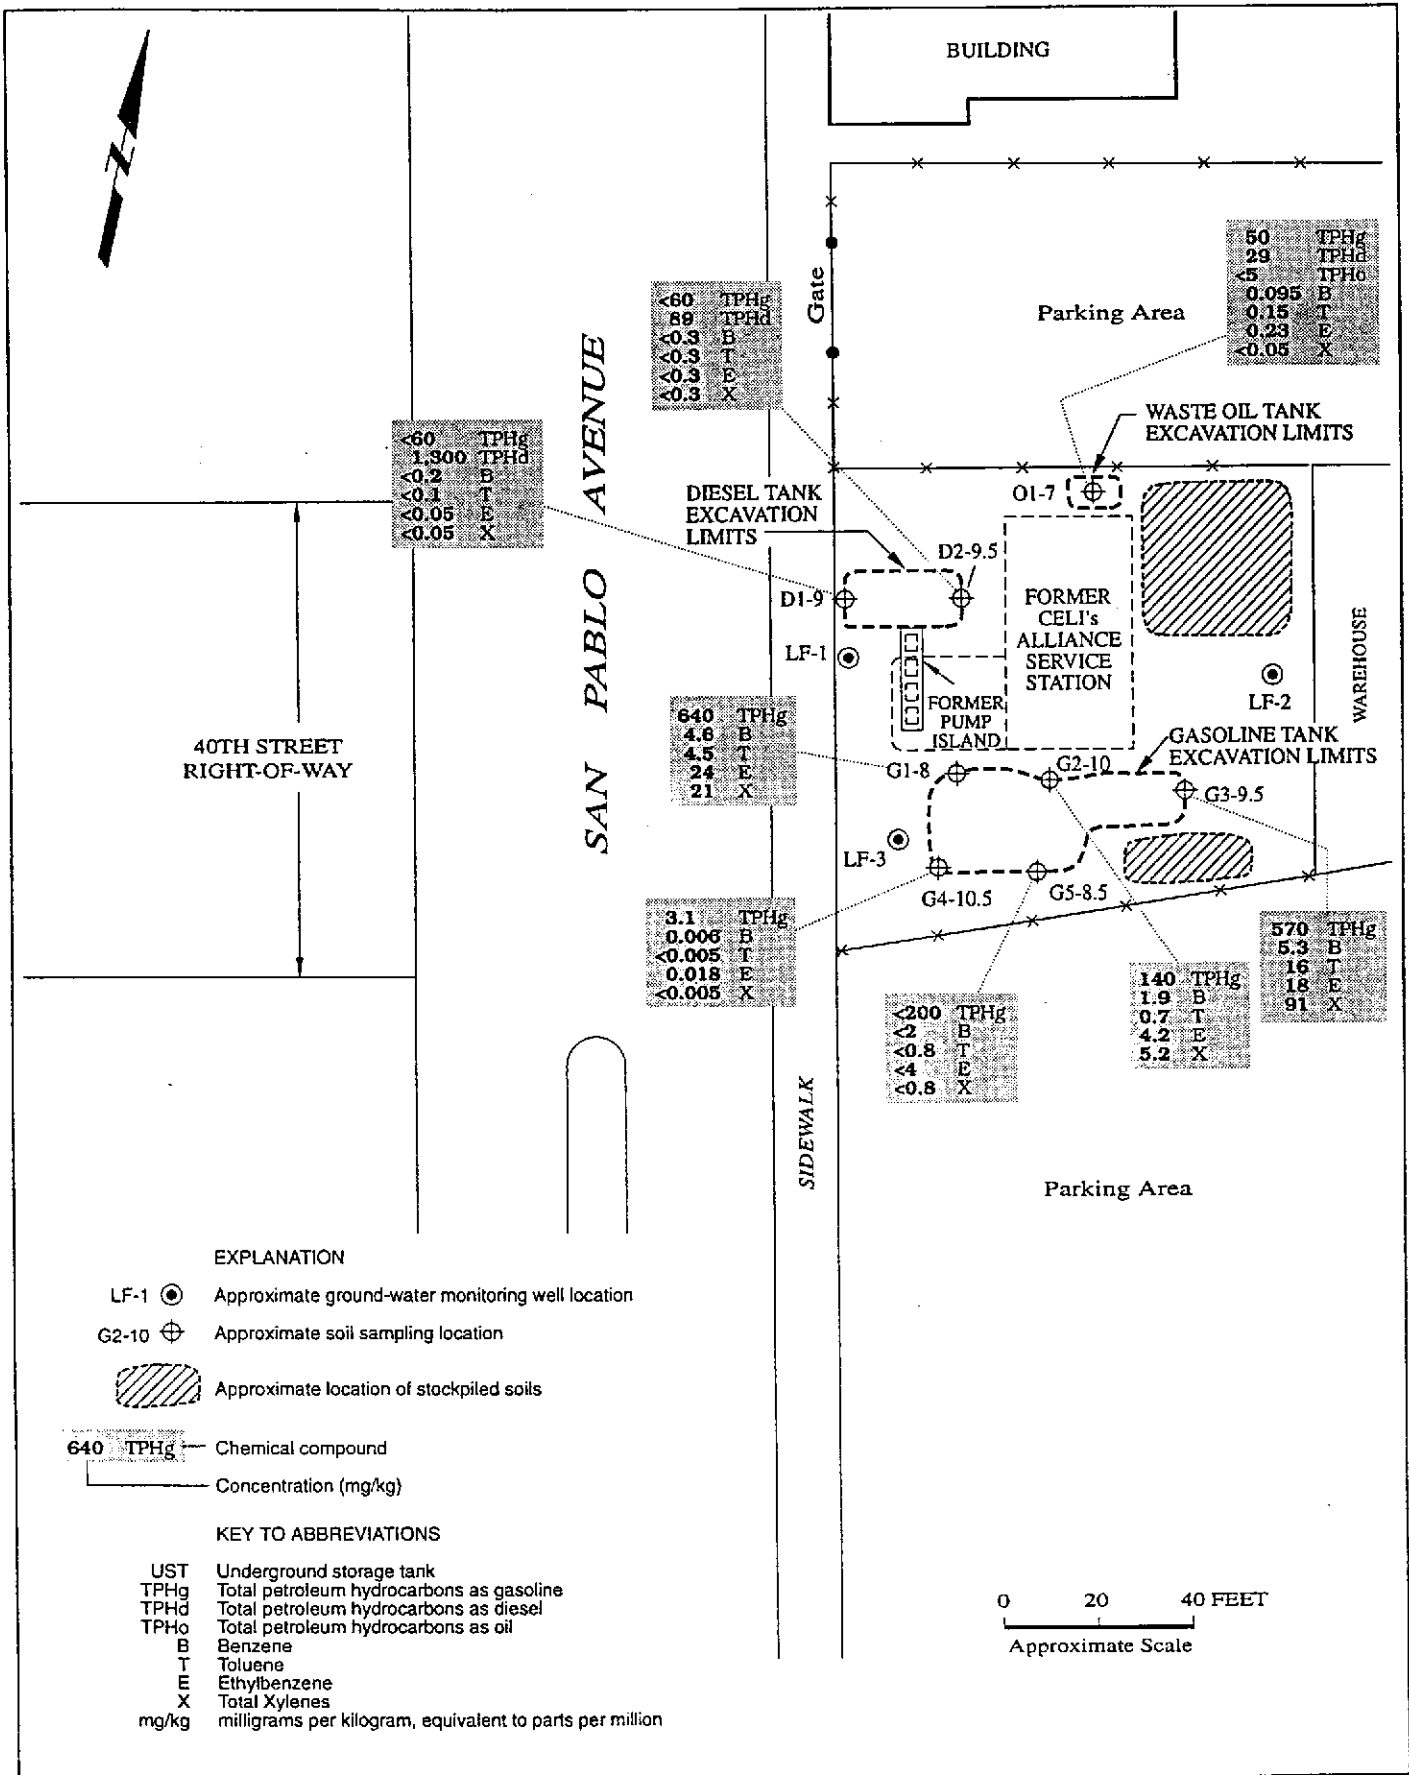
SITE PLAN SHOWING UST EXCAVATIONS, SOIL SAMPLING LOCATIONS AND TPH AND BTEX CONCENTRATIONS
